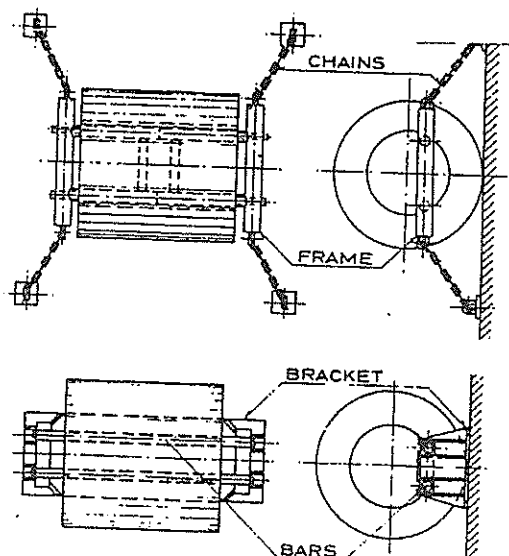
(c) Installation Arrangement for Hollow Cylindrical Fenders
